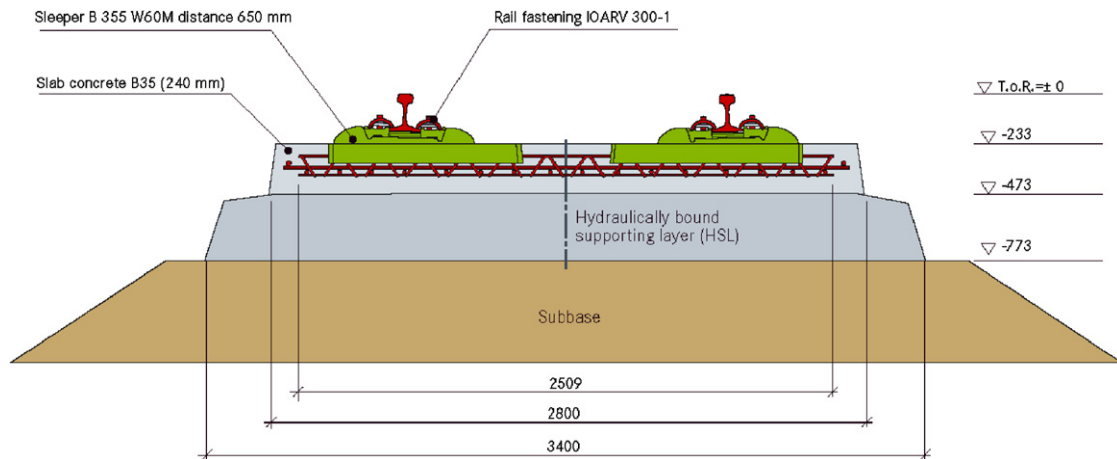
Example of a slab track design with reinforcement in the neutral axis (Rheda 2000 system).
